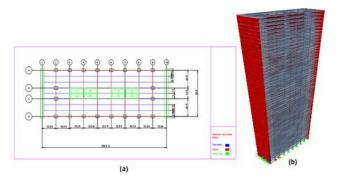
(a) Typical floor layout and (b) 3-D view of the 60-story building studied.
